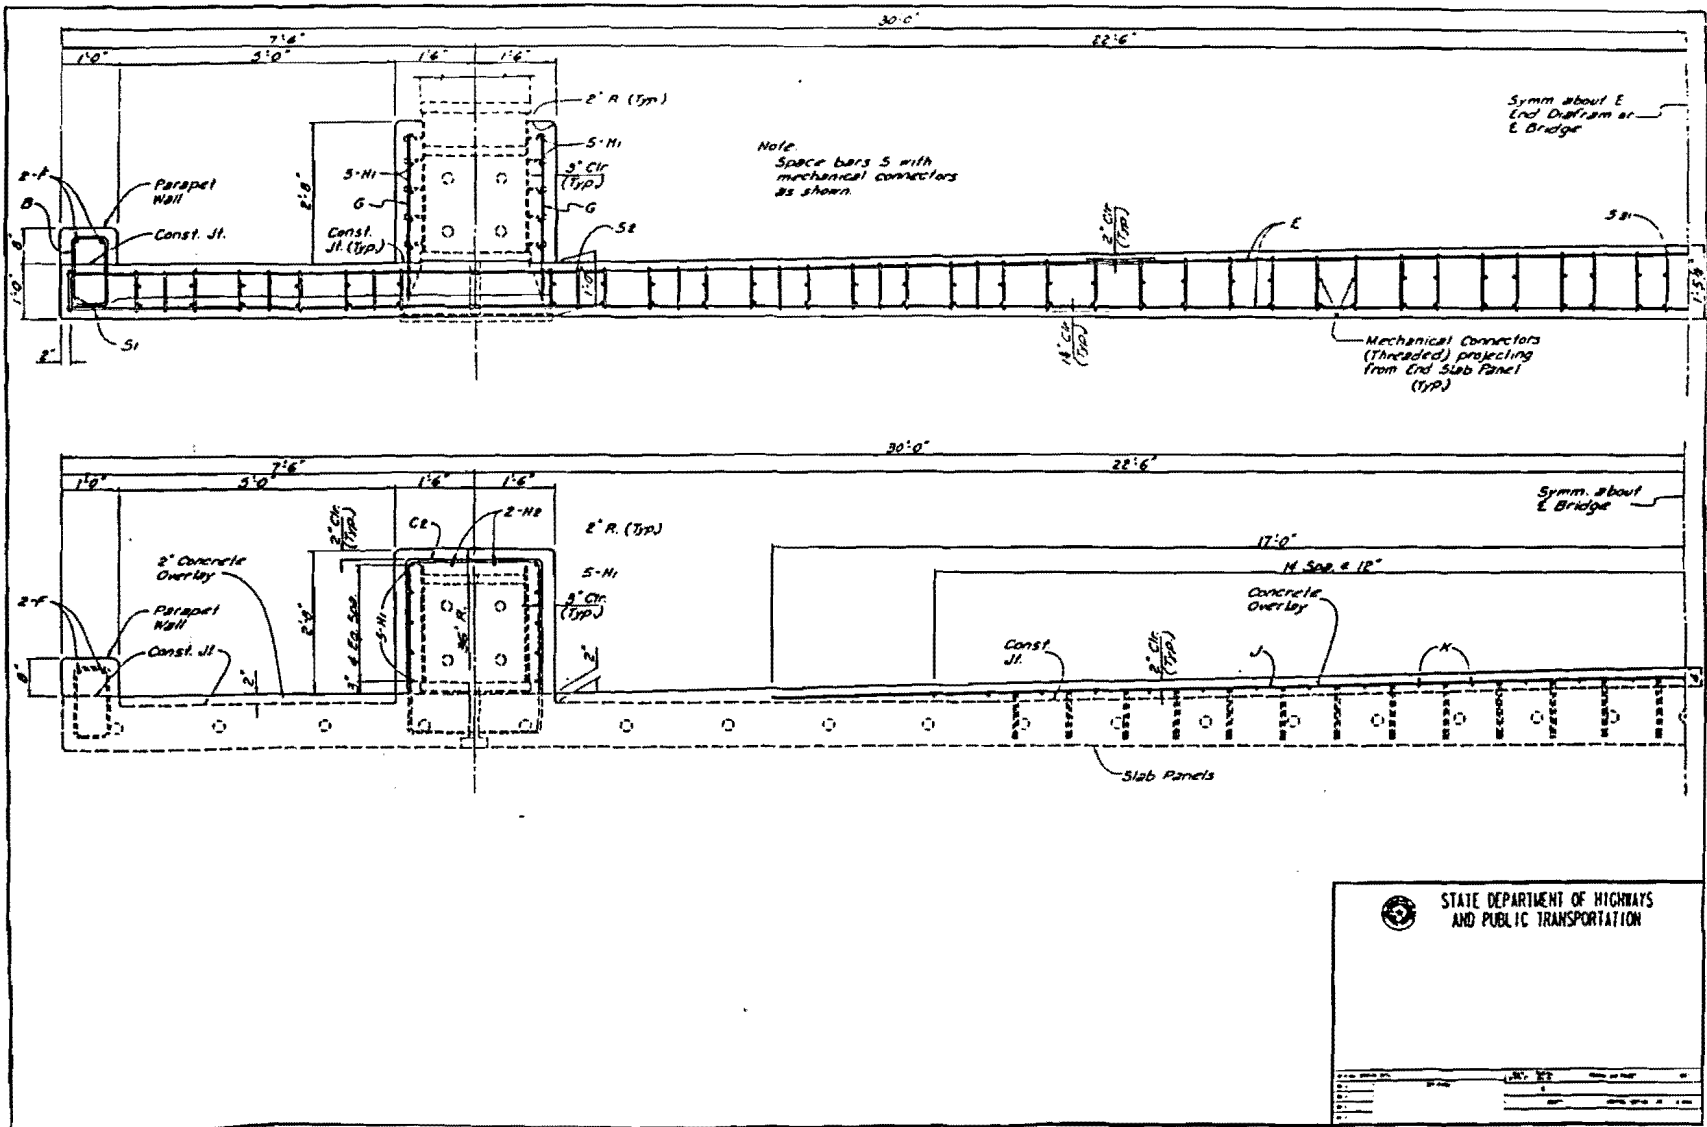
Cross-section of the Deck of a Typical Tied Arch Bridge (Houston District, TxDOT)
